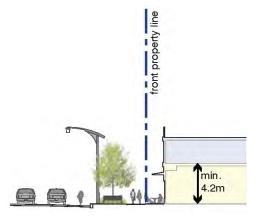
Buildings in the Community Core with retail at-grade should have a minimum ground floor height of 4.2m.
